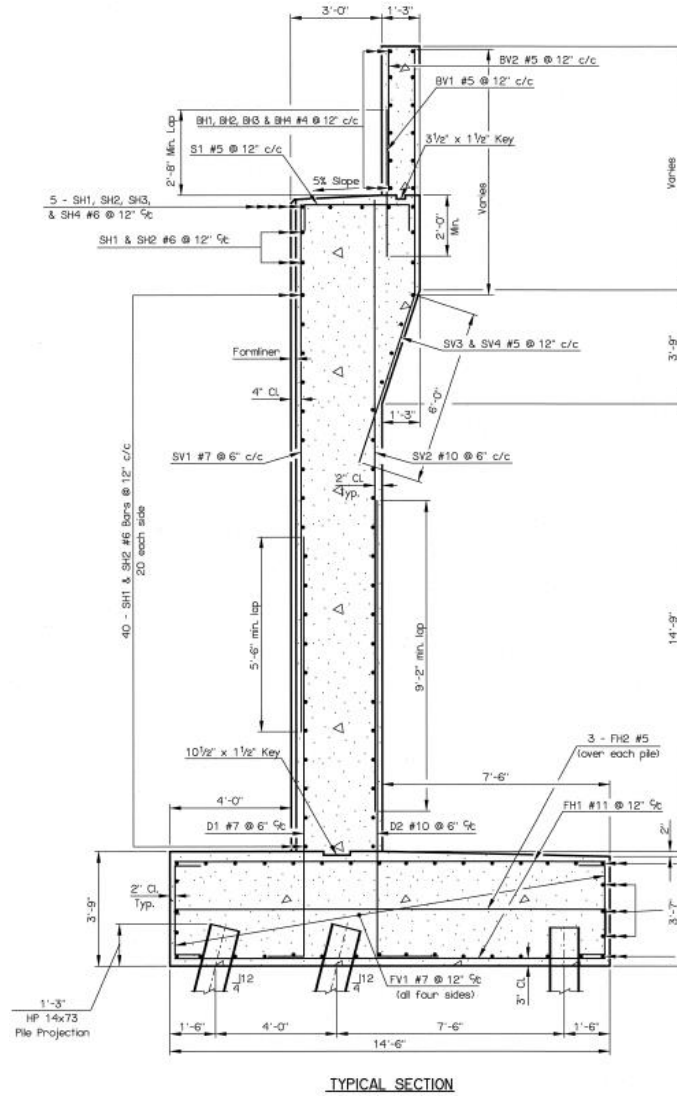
Full Height Abutment Detail; Main Street over I-35 in Norman, OK
